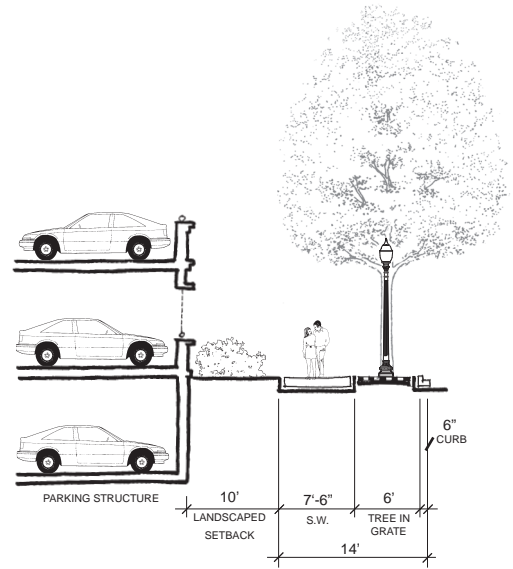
C.39: Partial Cross Section of Santa Clara Street at Public Parking Garage (in current surface parking lot of City Hall)
